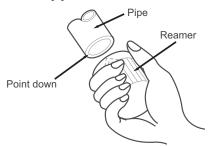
Remove Burrs with Reamer or Deburring Tool
